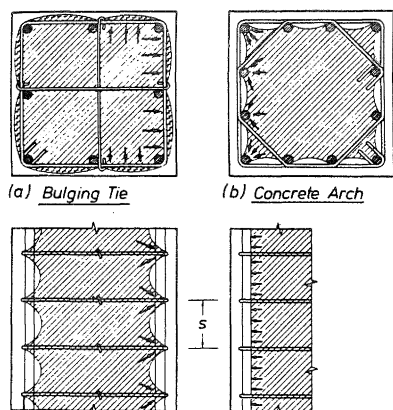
CONTRIBUTION OF OVERLAPPING TIES TO THE CONFINEMENT OF COMPRESSED CONCRETE IN COLUMNS
